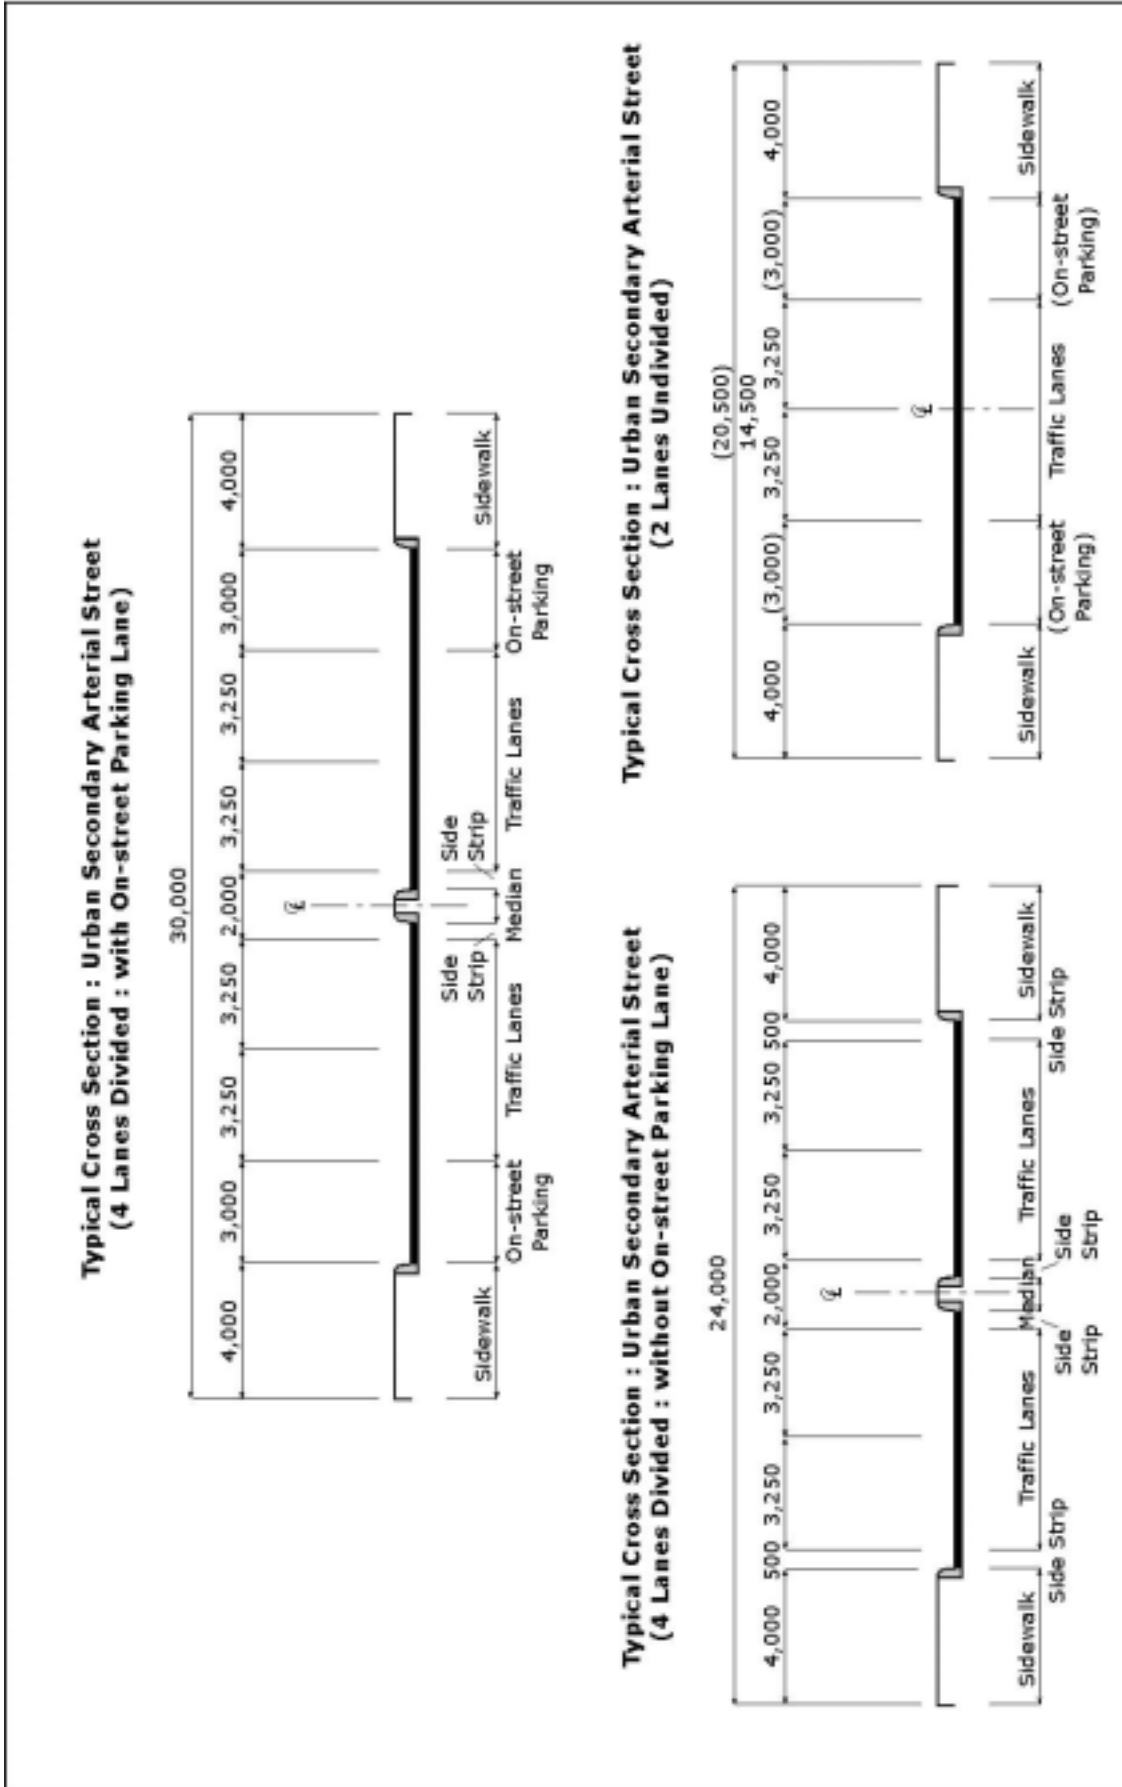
Typical Cross Sections for Urban Secondary Arterial Street
